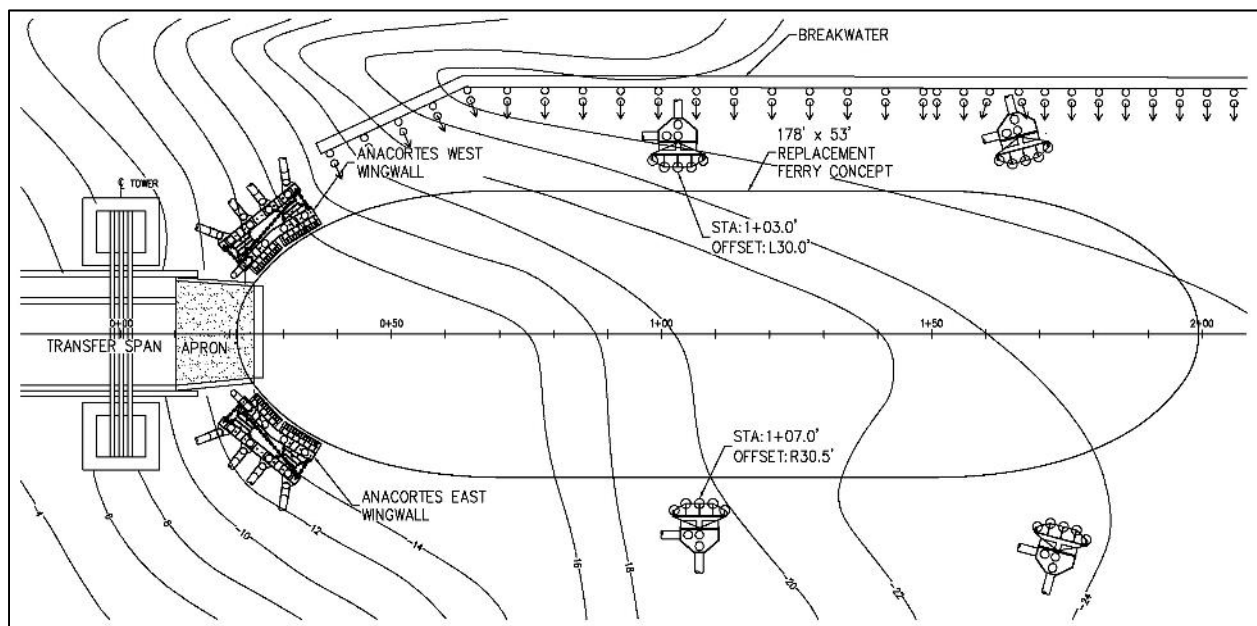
Anacortes terminal: as-built plan view and outline of 178' x 53' replacement ferry concept
